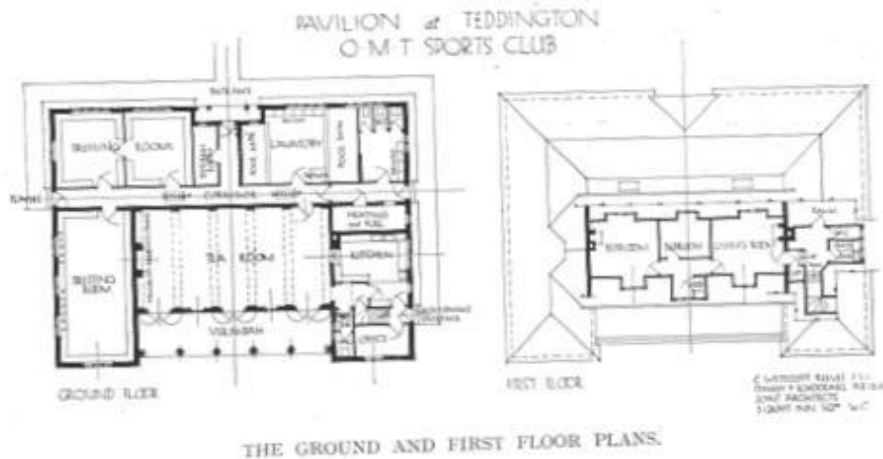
Description and floor plans from "The Smaller House, the latest practice in English domestic architecture"
